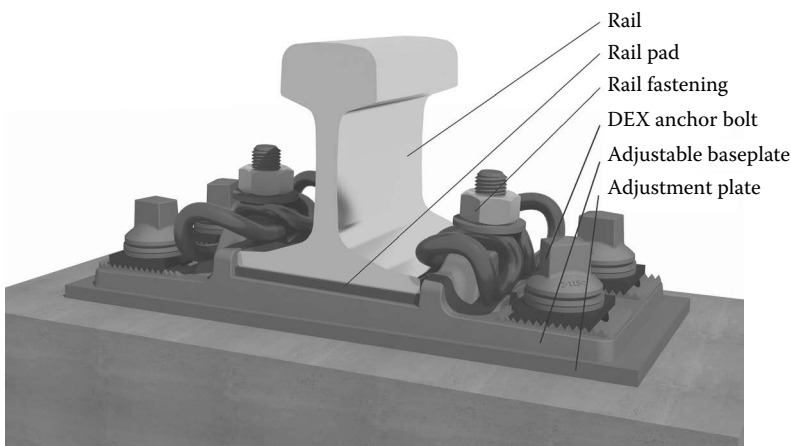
edilon)(sedra DFS (Direct Fastening System) with adjustable steel baseplate. (From edilon)(sedra, 2015.)
